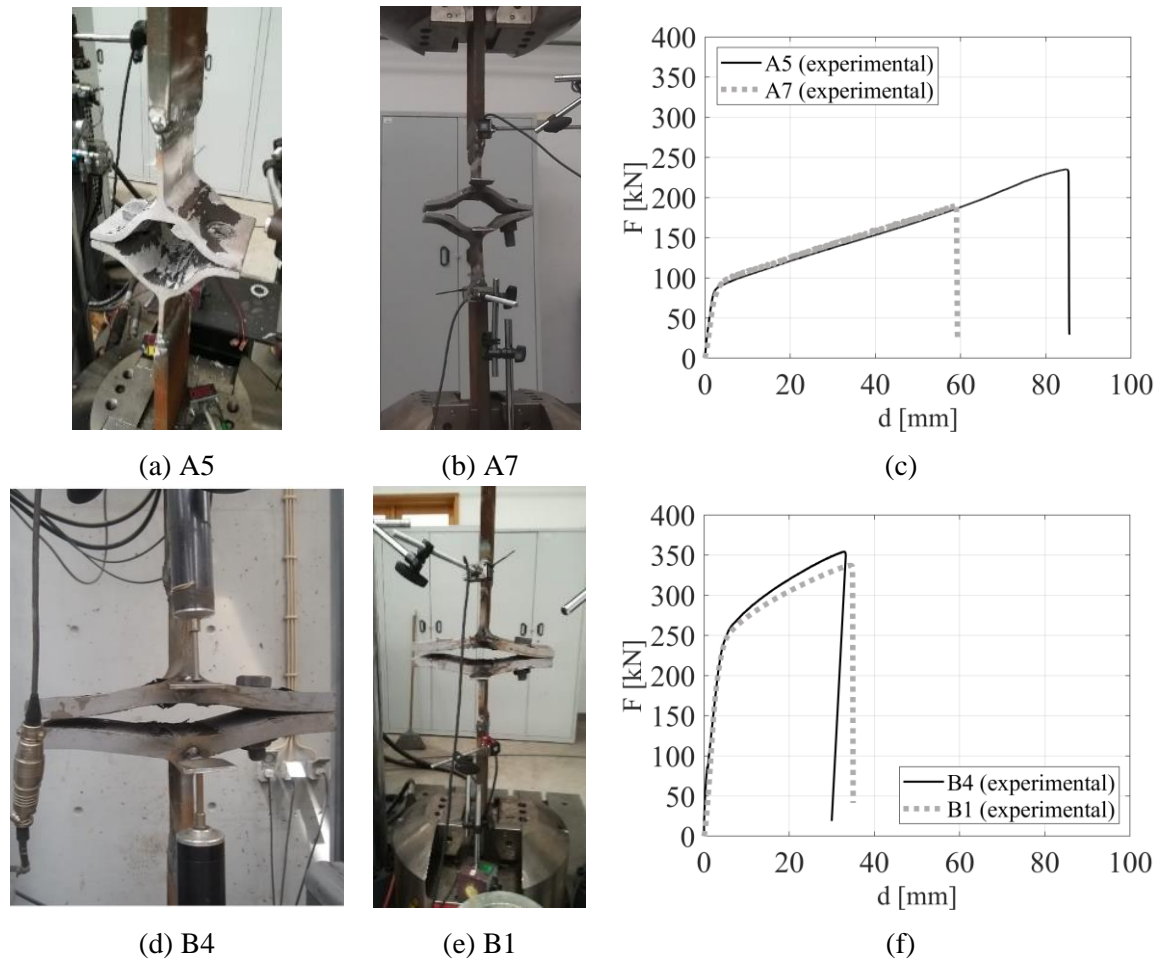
Monotonic tests: specimens after failure and force-deformation curves.
